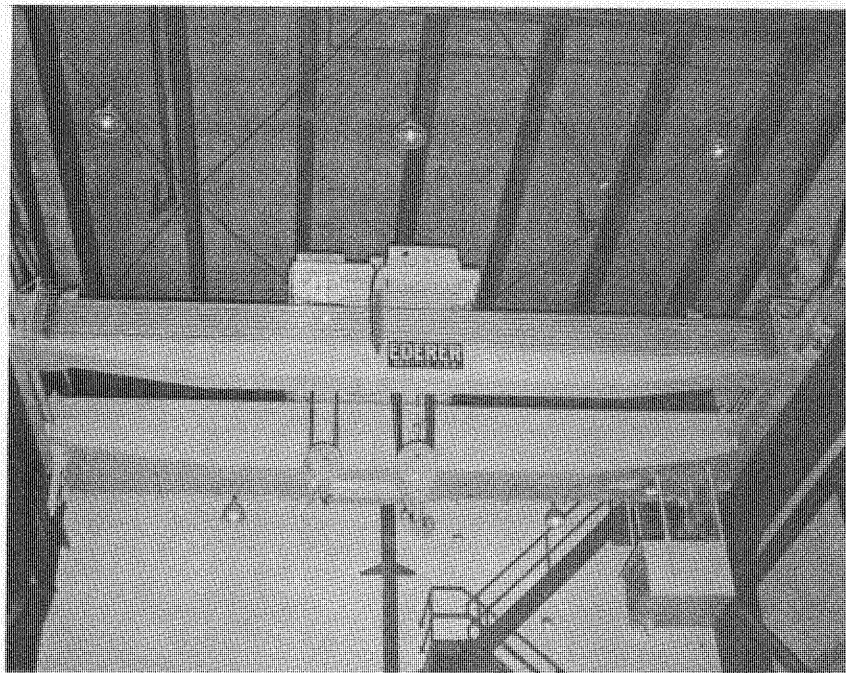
Interior view of powerplant showing 40-ton overhead traveling crane. 783-908-1762, May 3, 1955.
